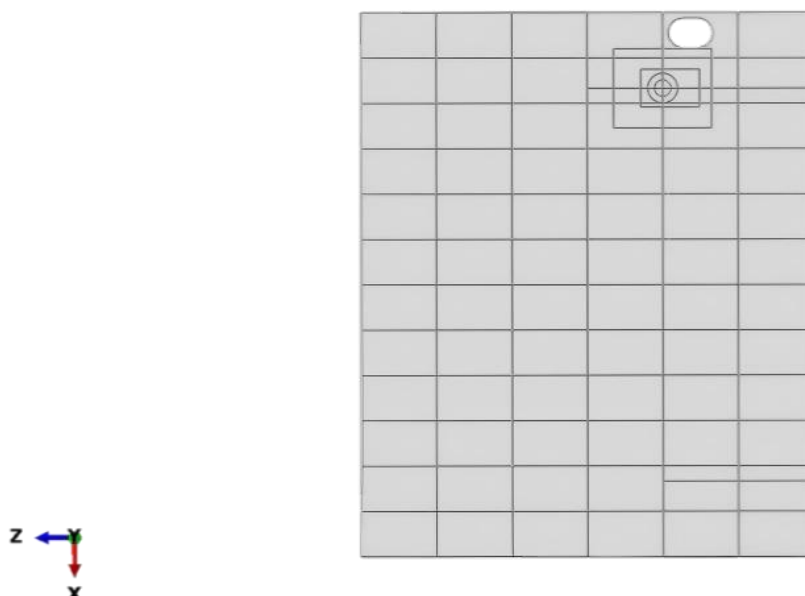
Deck plan showing the layout of longitudinal and transverse reinforcements and columns in Abaqus
